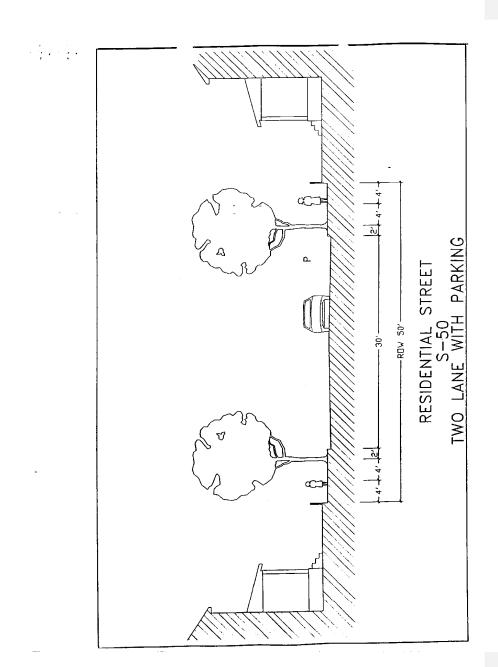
EXHIBIT B ON-SITE ROADWAY IMPROVEMENTS
